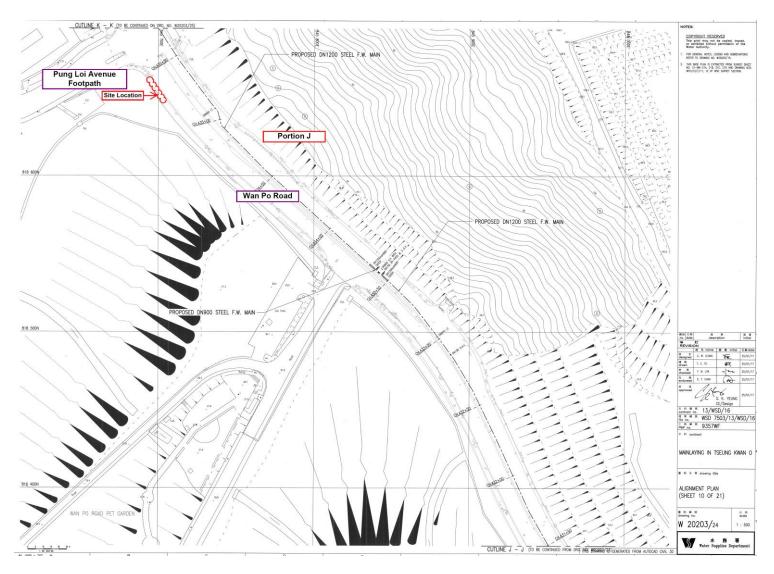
Location Plan for Portion J- Pung Loi Avenue Footpath (PLA 1)
